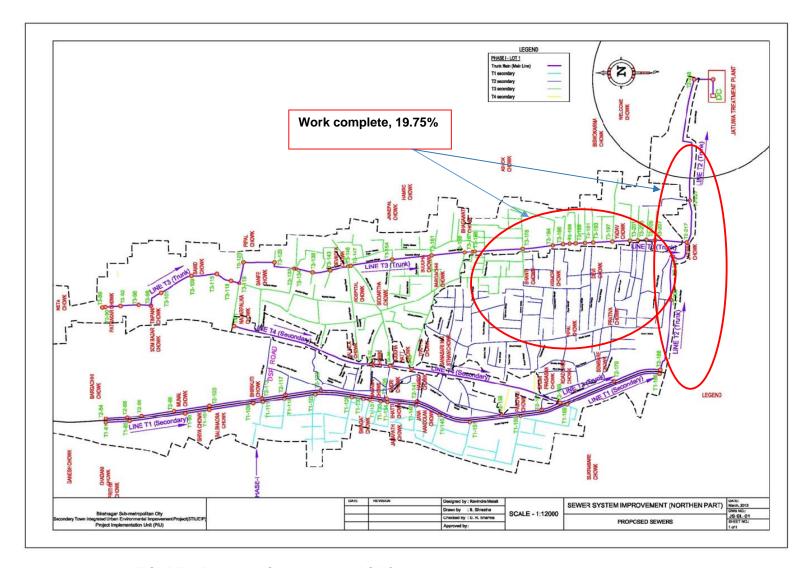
PROPOSED SEWER LINES IN BSMC
